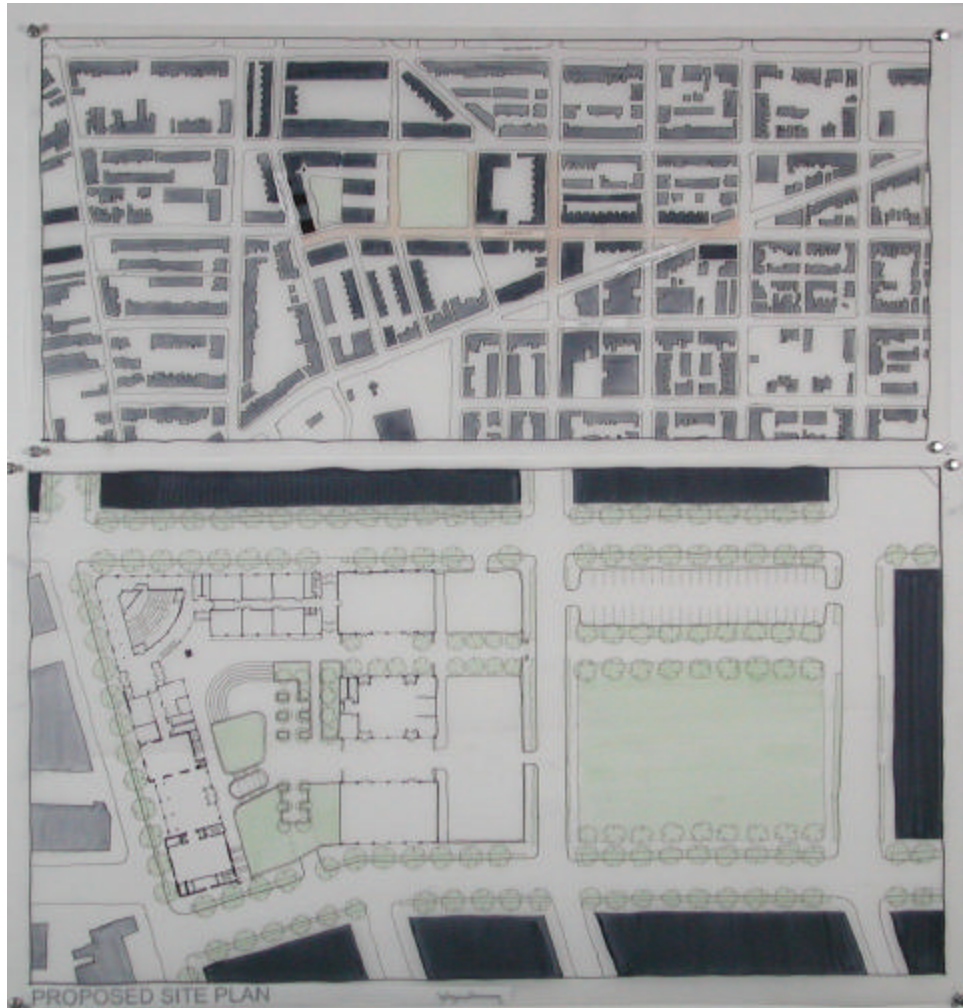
Proposed City and site plan. Existing buildings to remain shown in black, new buildings are shown dark gray. Existing buildings to remain are light gray. Colored streets are new.
